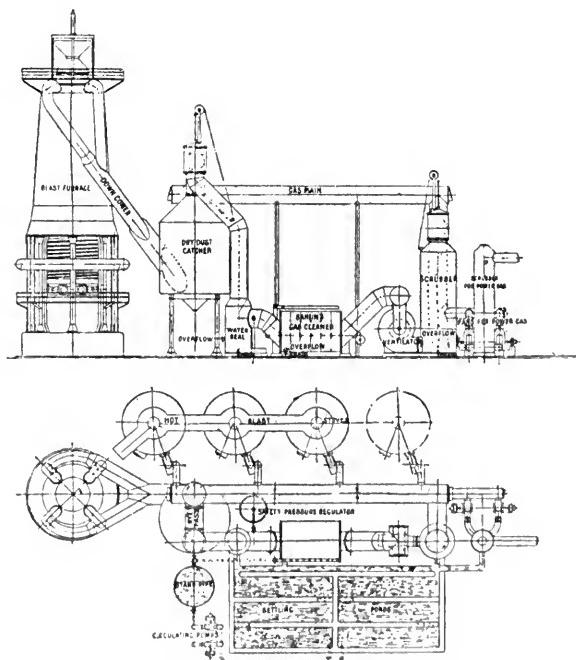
GENERAL ARRANGEMENT OF CLEANING PLANT.
